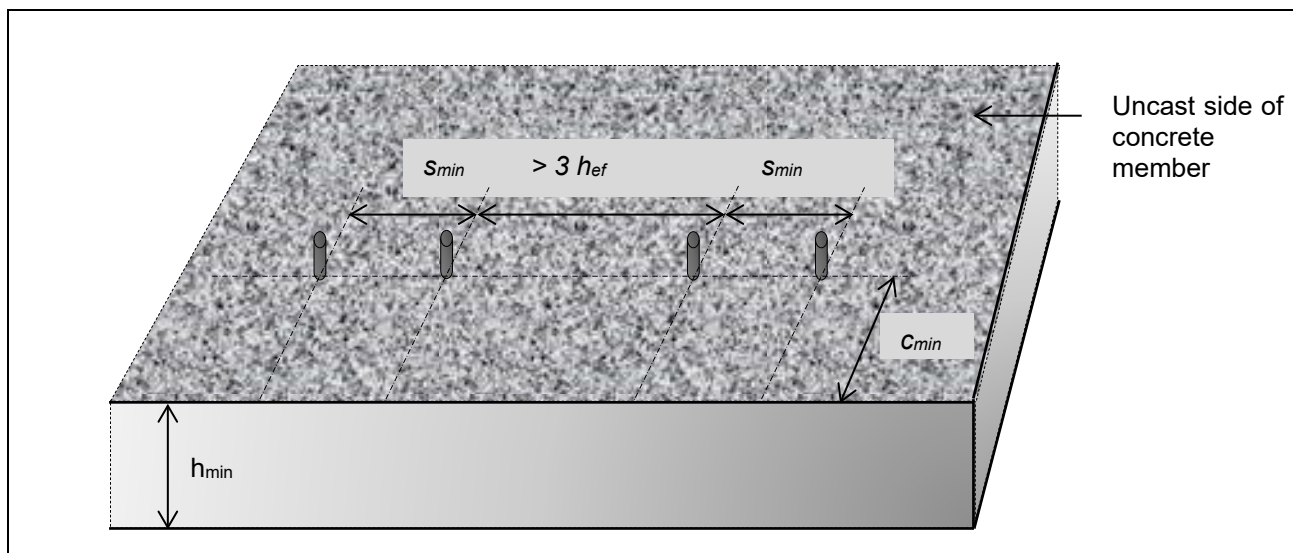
Installation of fasteners at the edge of concrete member
